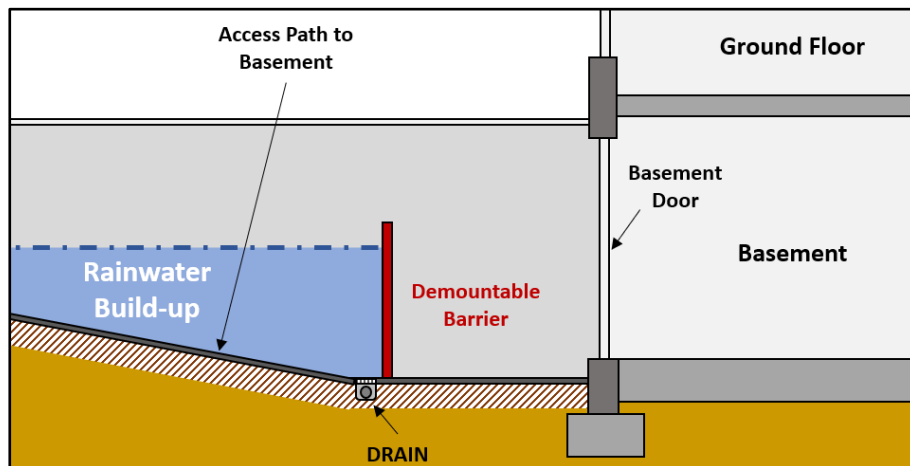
Examples of Facility Flood Protection Measures – Demountable Barrier
